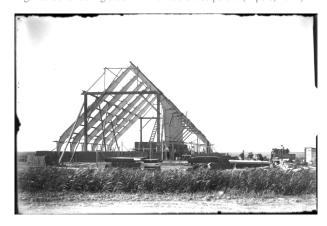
Laminated timber truss construction on Texel (Eelman, 2021).
